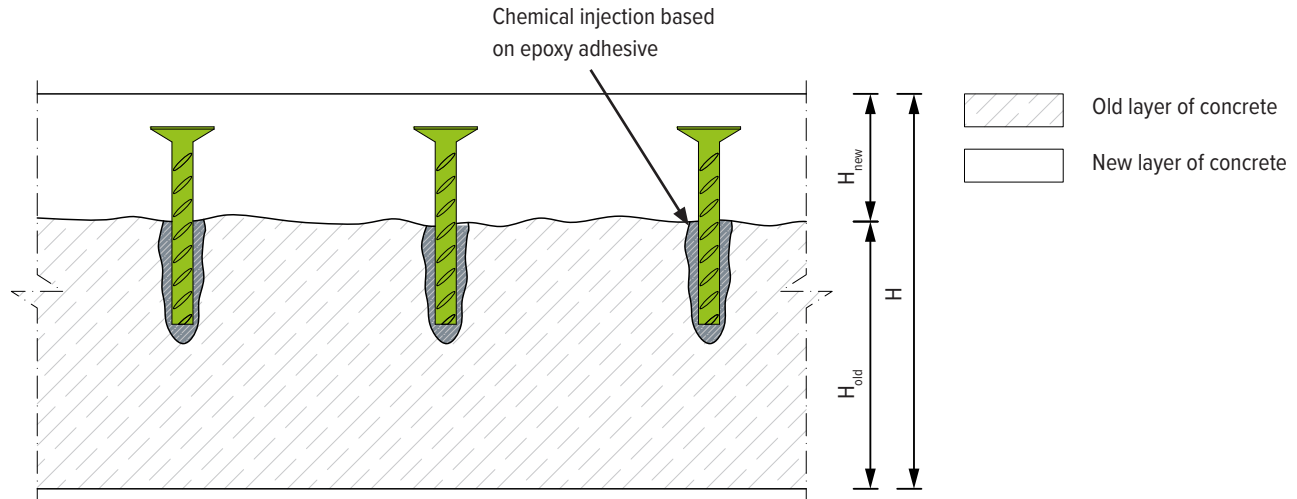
SHEAR CONNECTION BETWEEN OLD AND NEW LAYER OF CONCRETE SECURED BY PSB® HEADED ANCHORS
